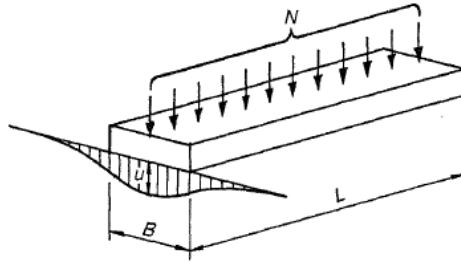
Ground deformations due to loading of strip foundations (Herzog 1999)
